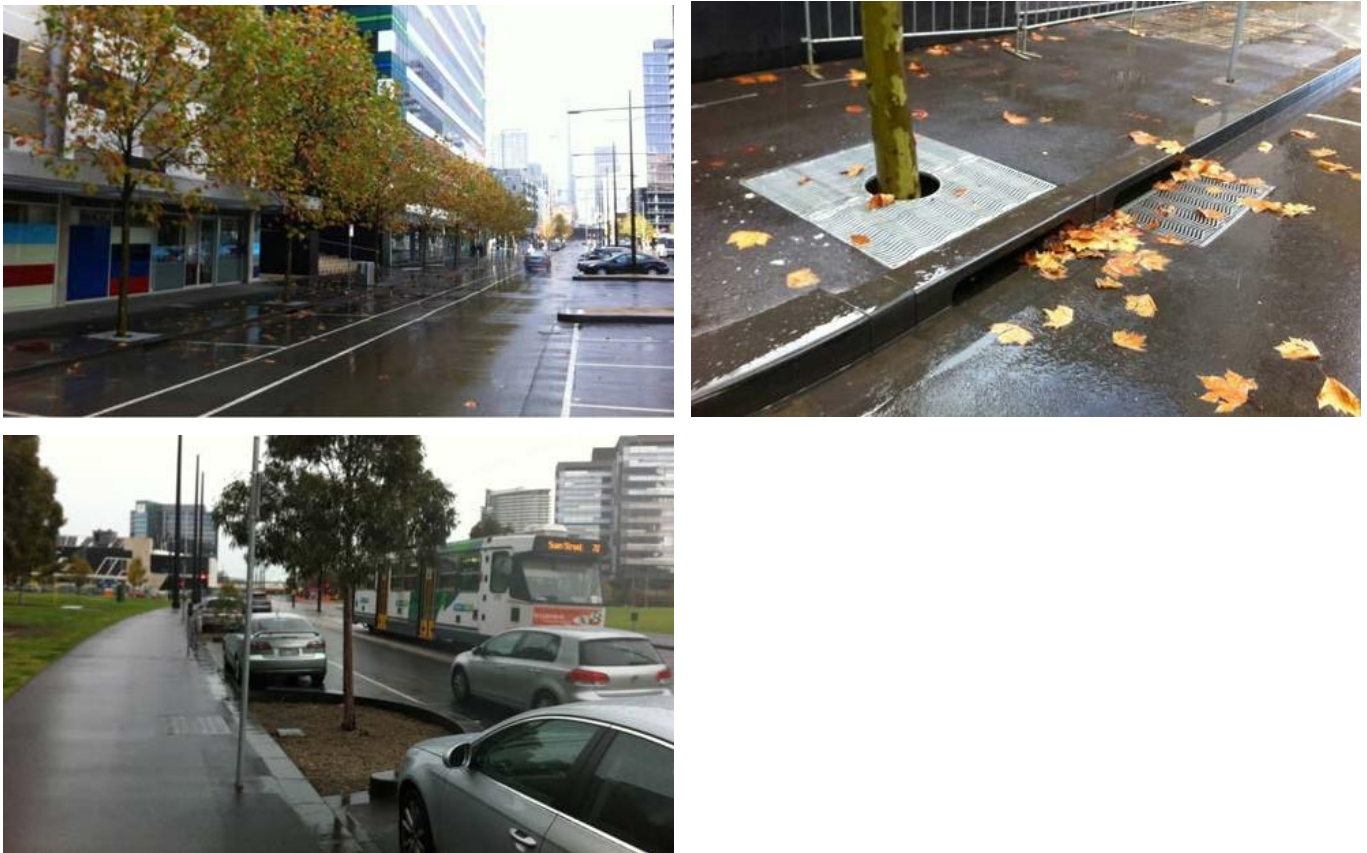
Examples of bioretention street trees. Photo credits: all photos, Brad Dalrymple.
